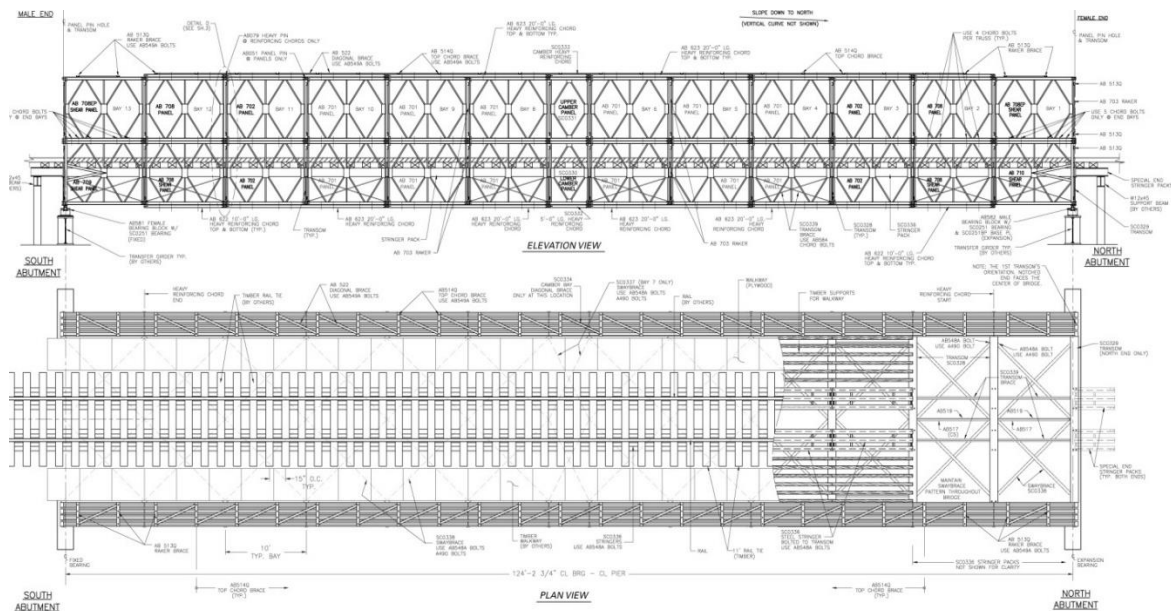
Plan and Elevation of Acrow 700XS Customized for Railway Loads [39]
